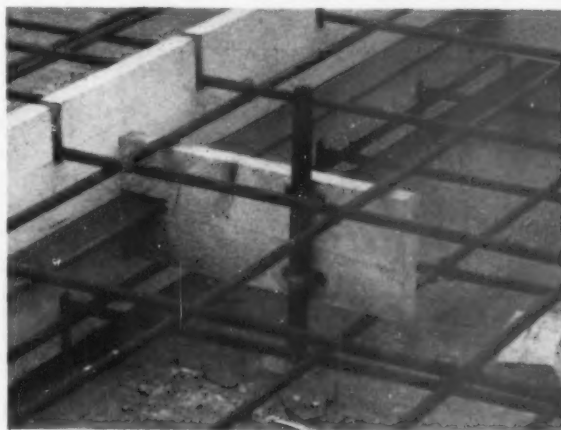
Waterstop inserted in formwork for construction joint ready for pouring concrete
